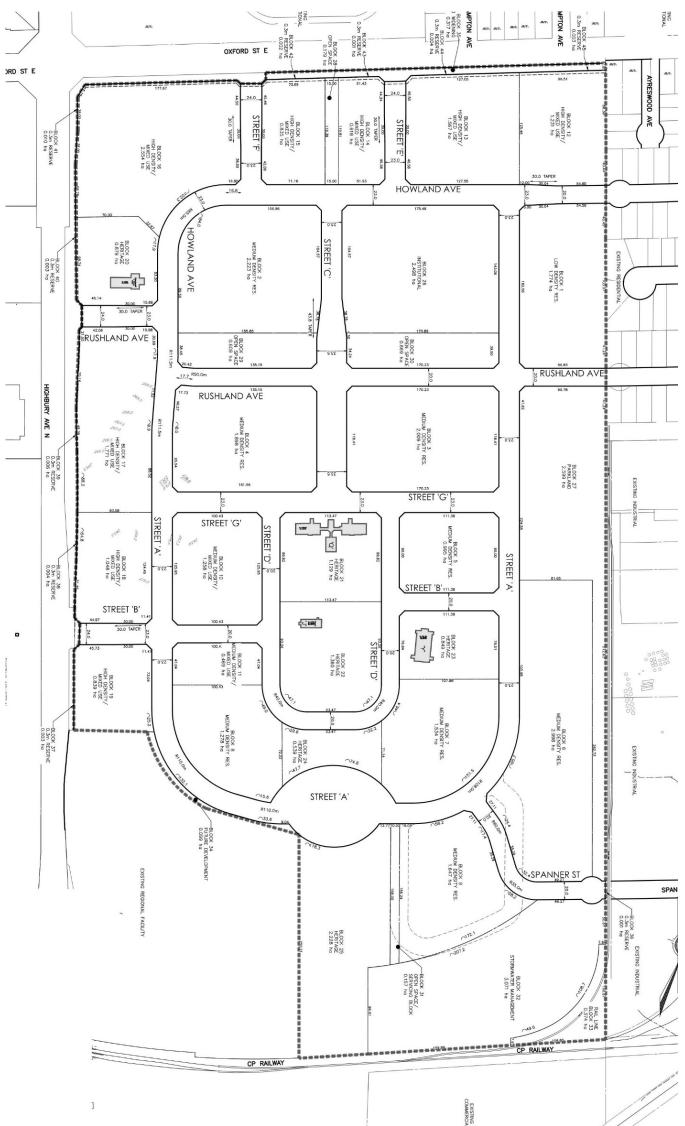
Excerpt from Revised Draft Plan of Subdivision for 850 Highbury Avenue North
